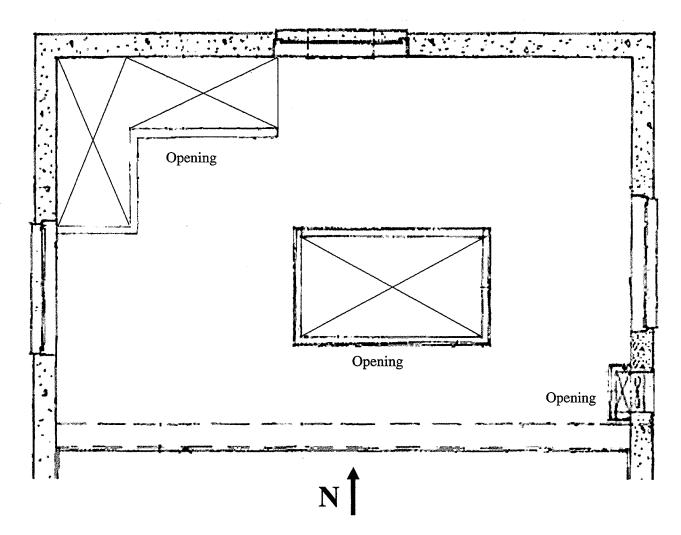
C-402 Lime House Floor Slab Partial Plan View Showing Floor Openings to Basement
